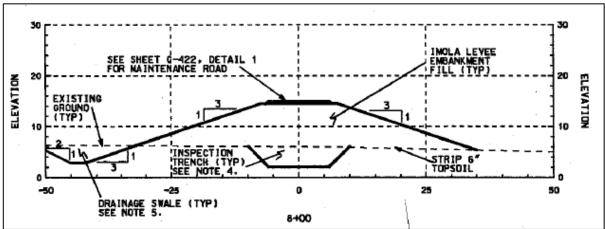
Typical Levee Cross Section Imola Levee Section
